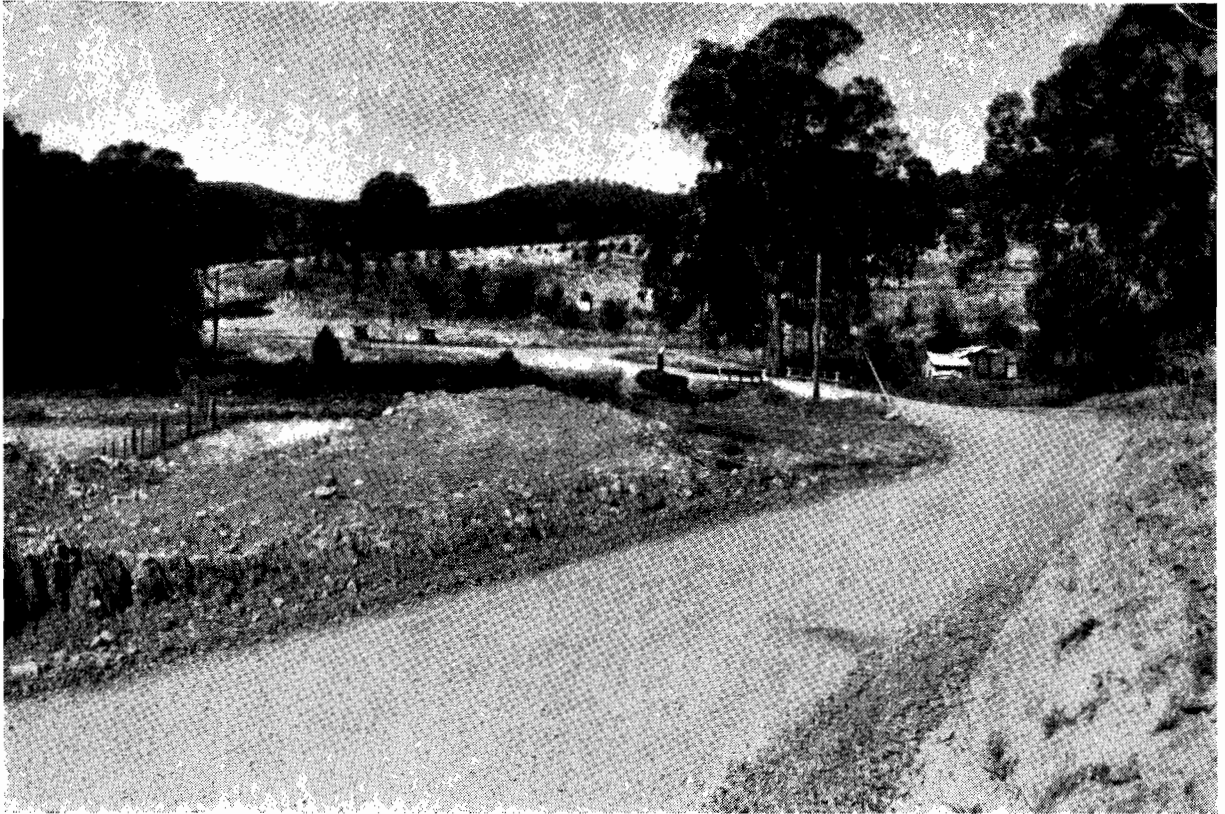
Upper Goulburn Road. Old narrow bridge on road to Eildon Weir at Snob's Creek.
